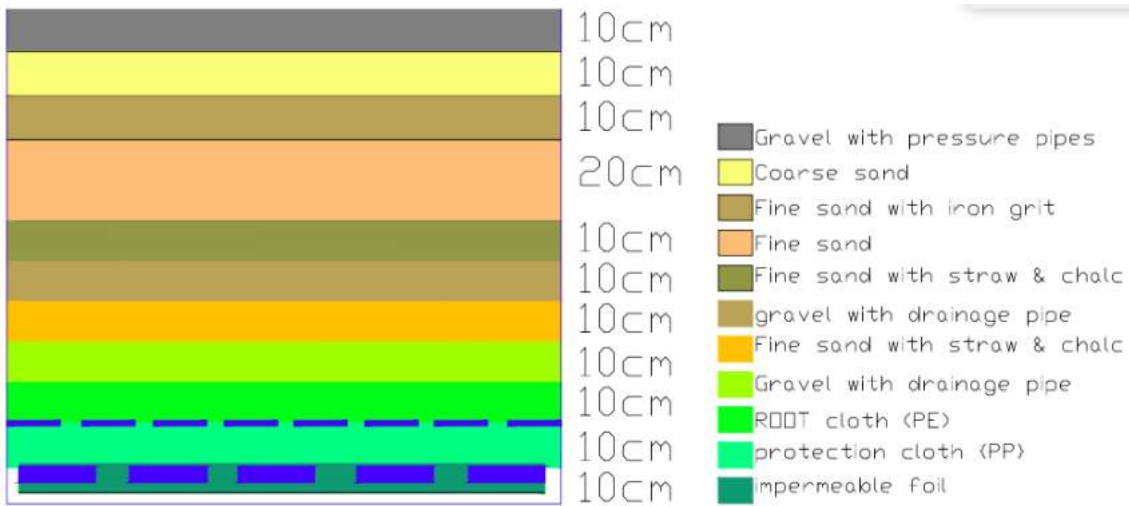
Details of the Layers Vertical Flow Constructed Wetland
